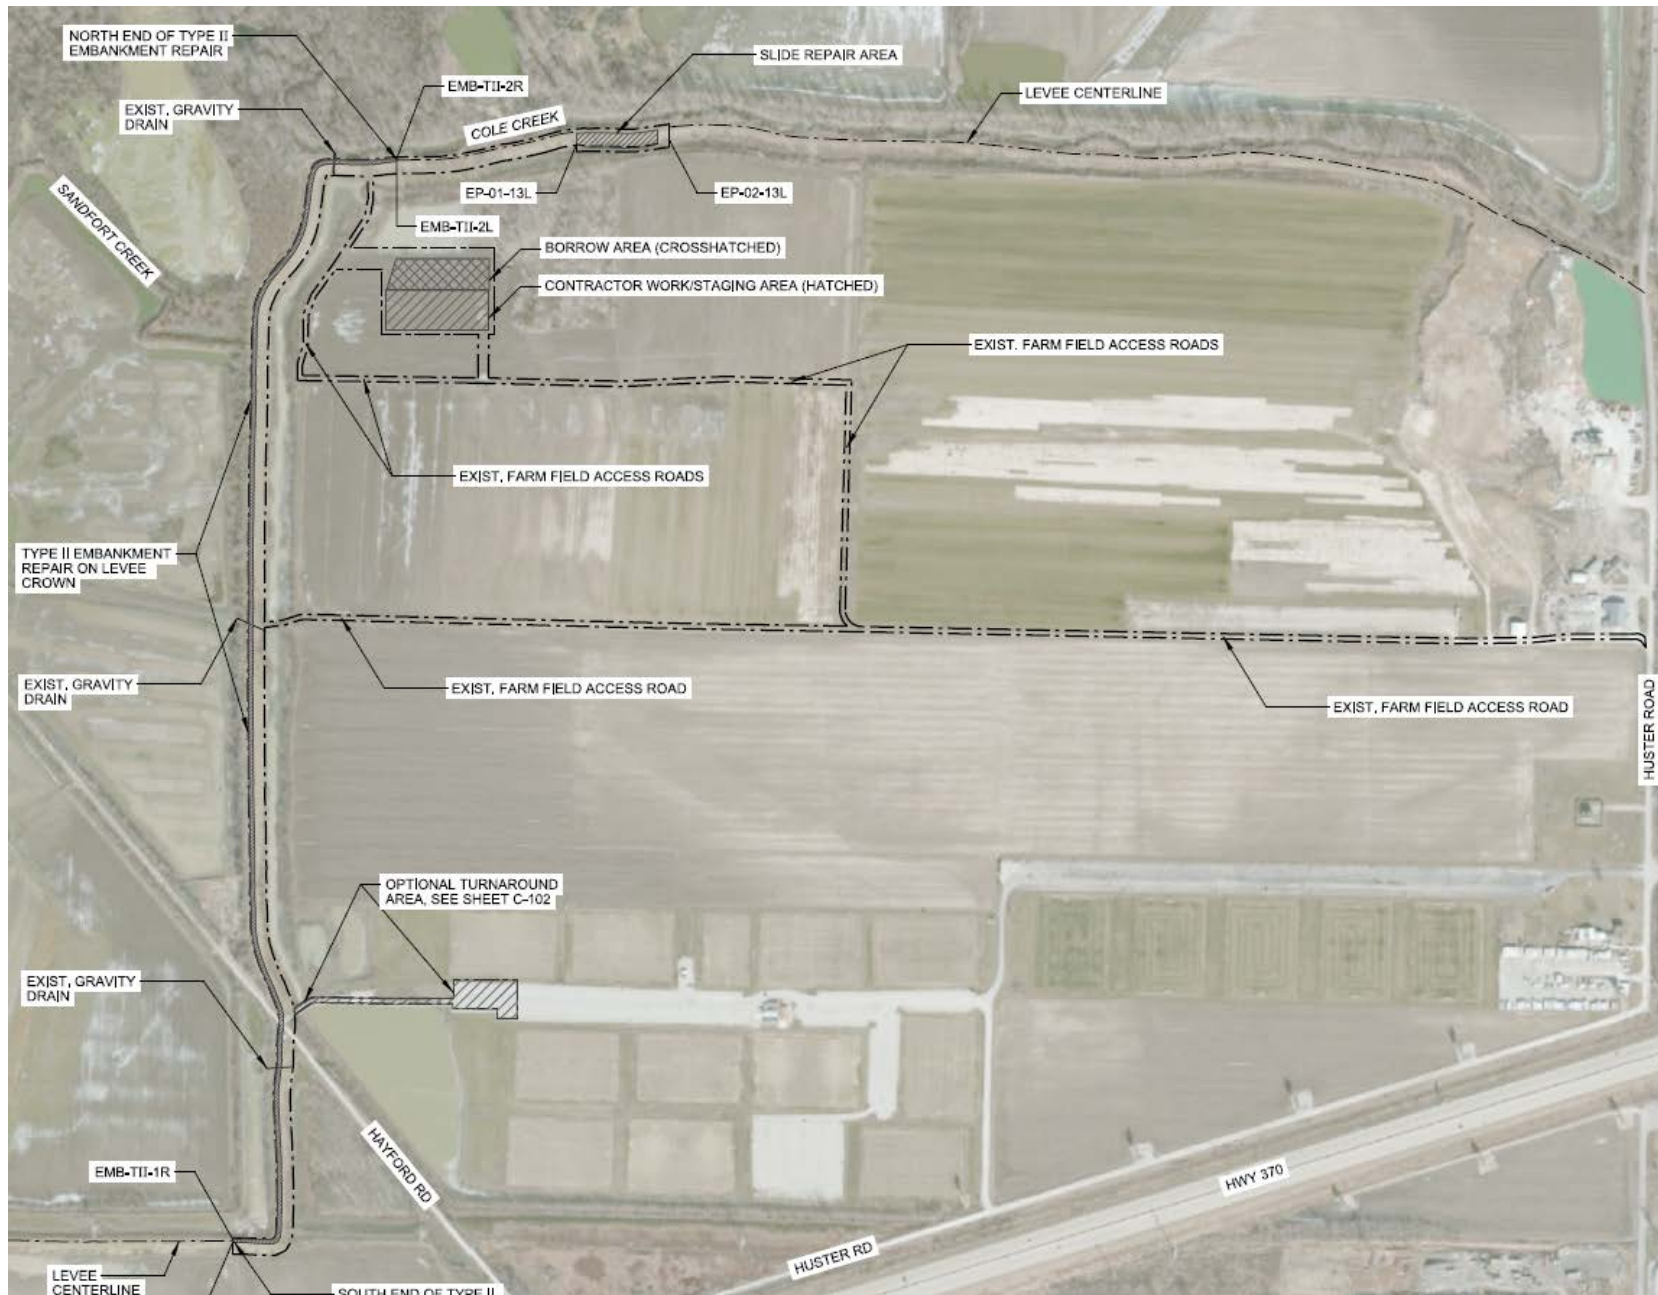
Elm Point Levee Association Construction Limits and Borrow Site
